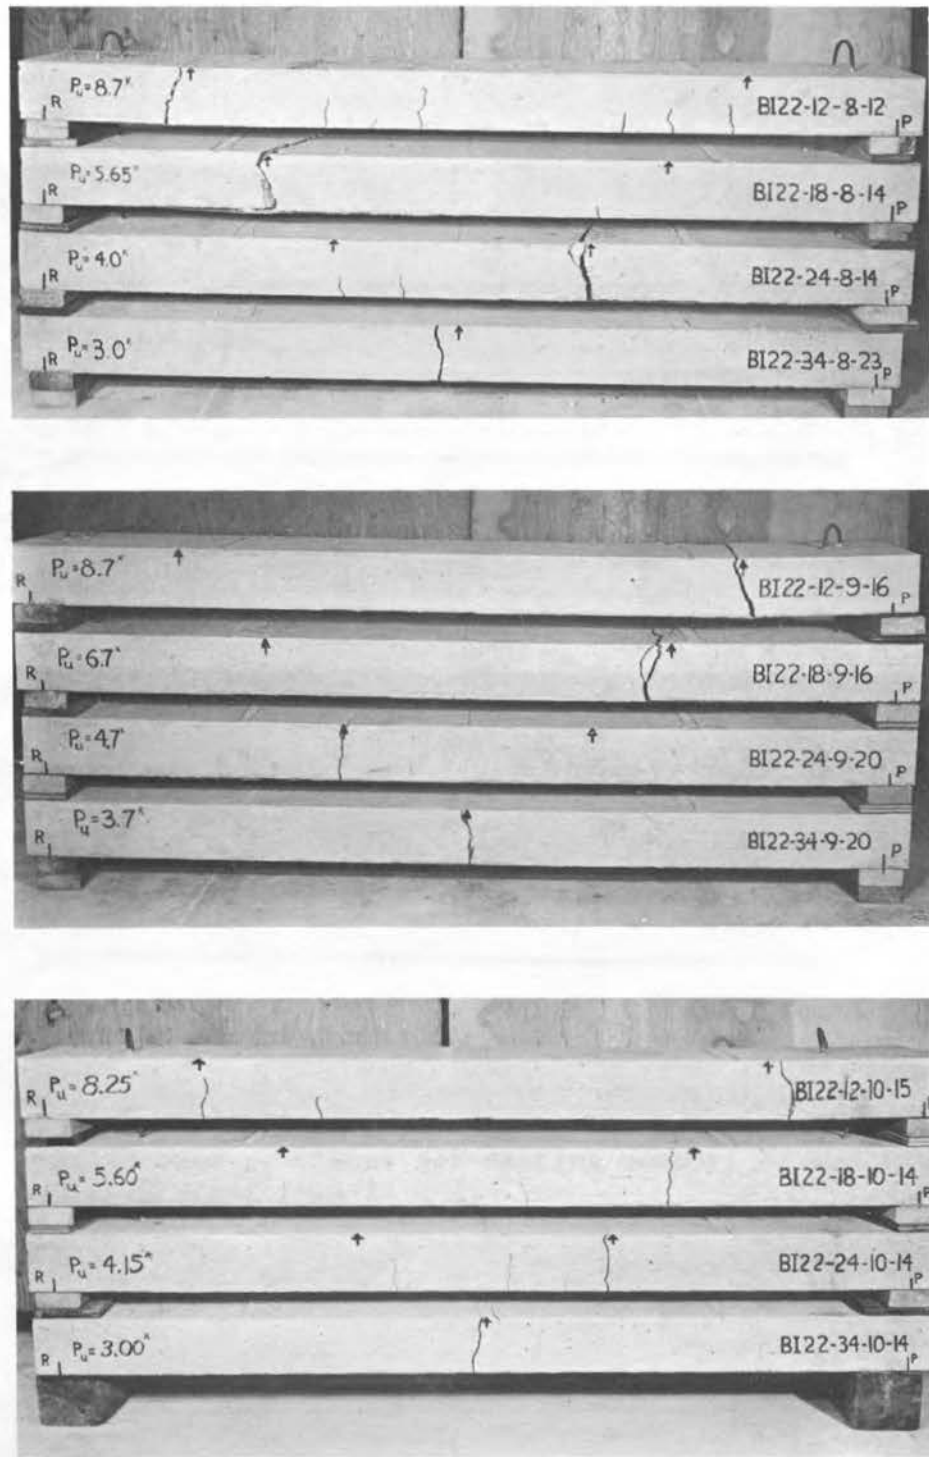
Failed beam specimens for casting numbers 8, 9, and 10 using 22-gage steel form I.
